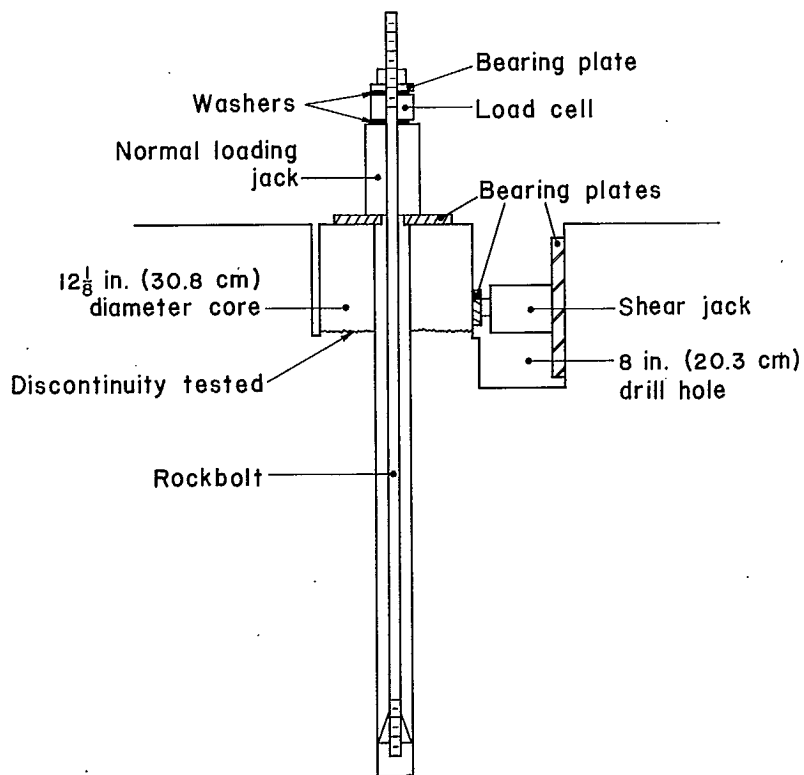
Direct shear test in 12 7/8 in. (32.7 cm) diameter hole; the shear jack is located in adjoining 8 in. (20.3 cm) diameter hole.
